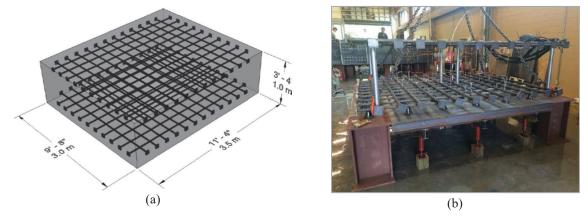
(a) Unconfined thick concrete specimen design representative of a typical nuclear power plant structure. (b) Picture of rebar frame with the bottom framework for unconfined concrete specimen.
